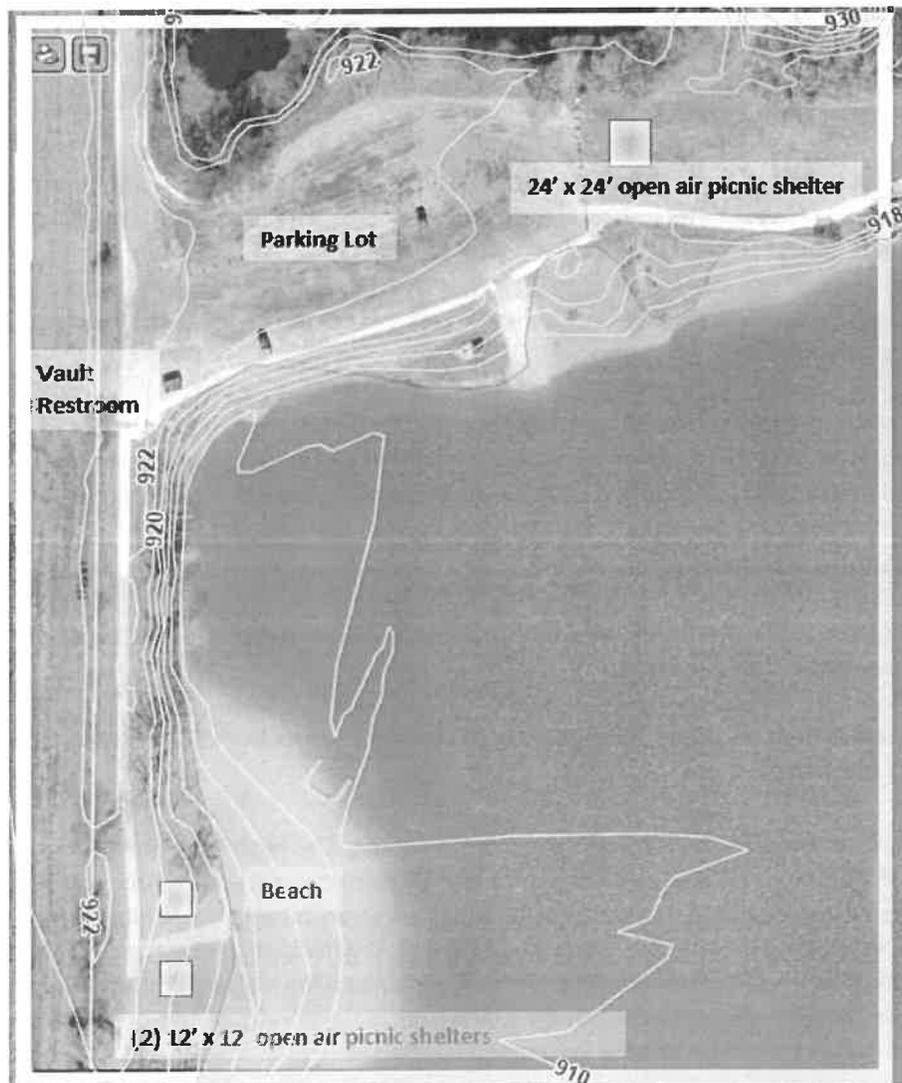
Site Plan with Floodplain Overlay (pink shading) and Contours
